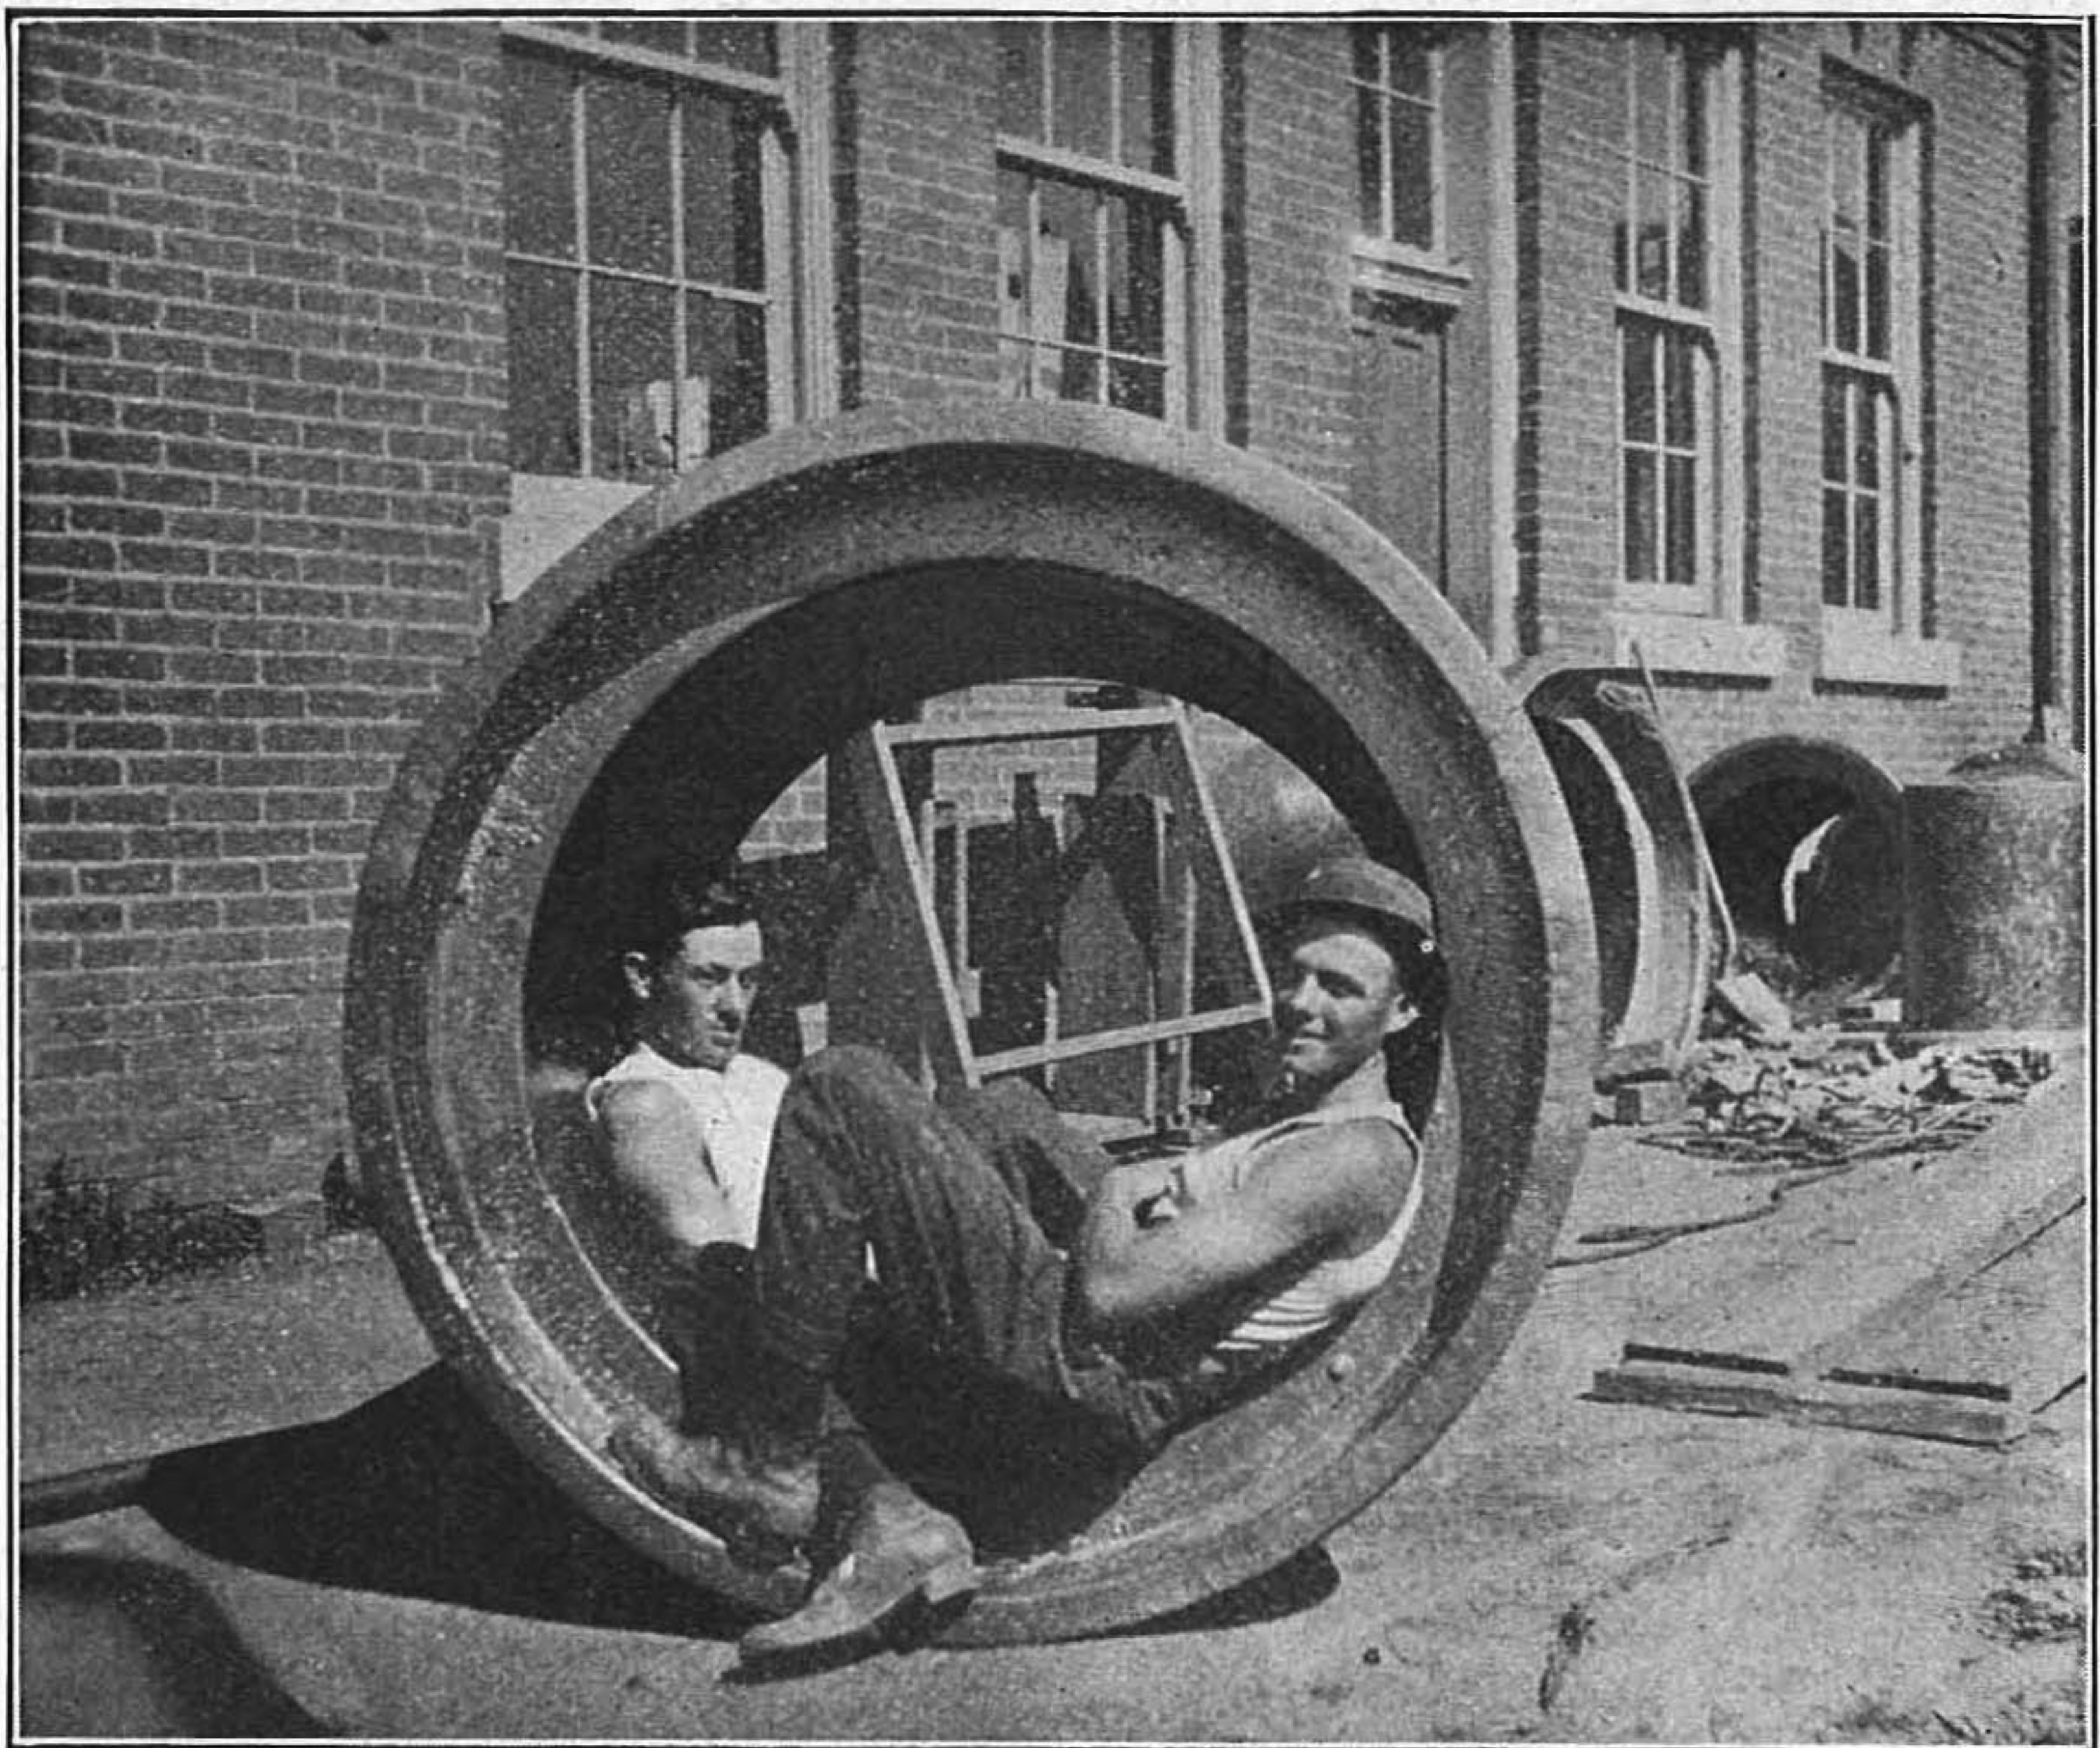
Forty-two Inch Vitrified Clay Sewer Pipe, about to be Placed in the Testing Machine.
